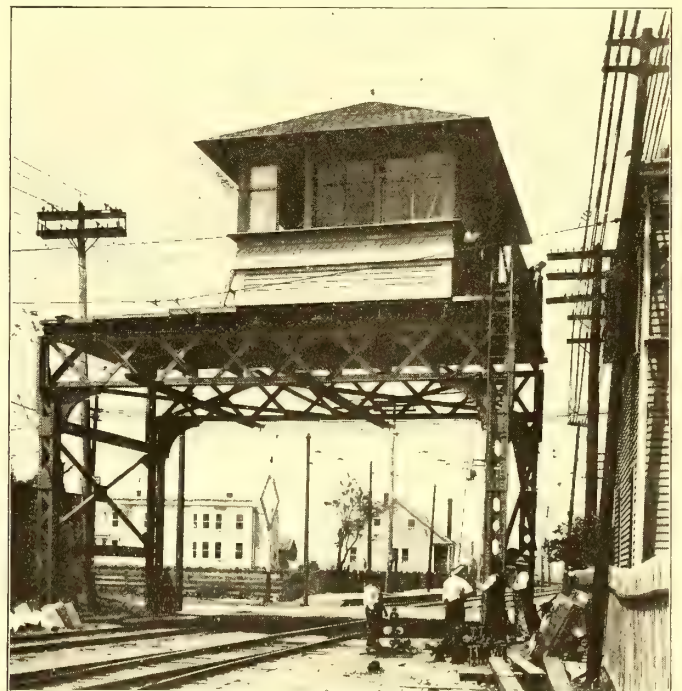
THE ELEVATED SIGNAL TOWER AT THE NORTH ENTRANCE TO THE TERMINAL YARD
